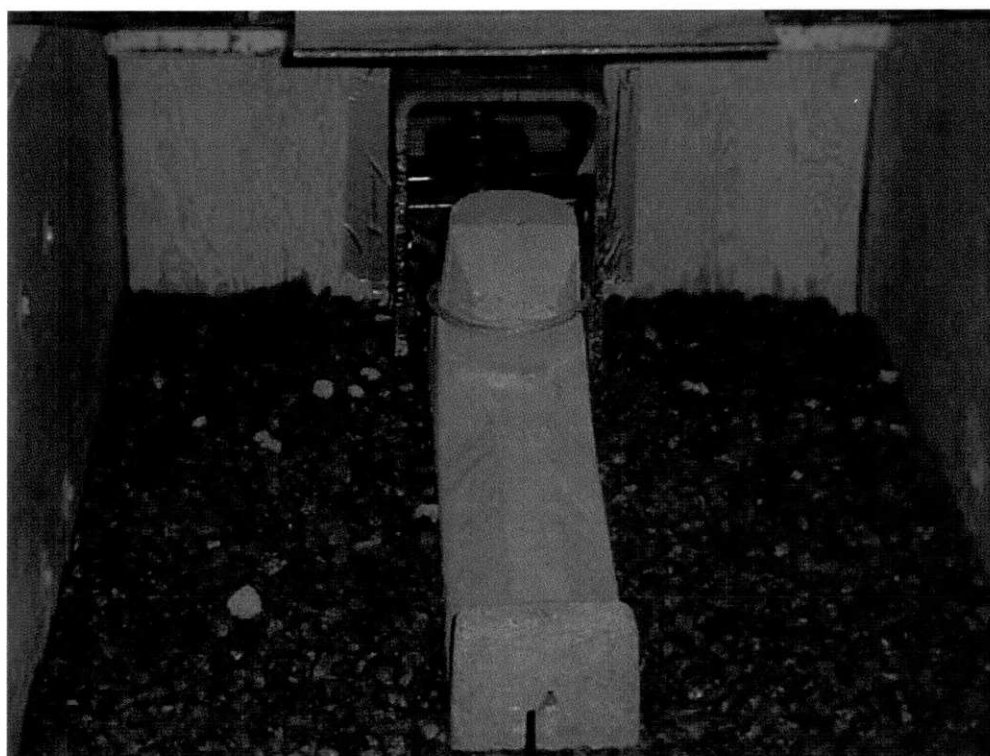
Photograph showing the steel sleeve and the counterfort specimen prior to testing.
